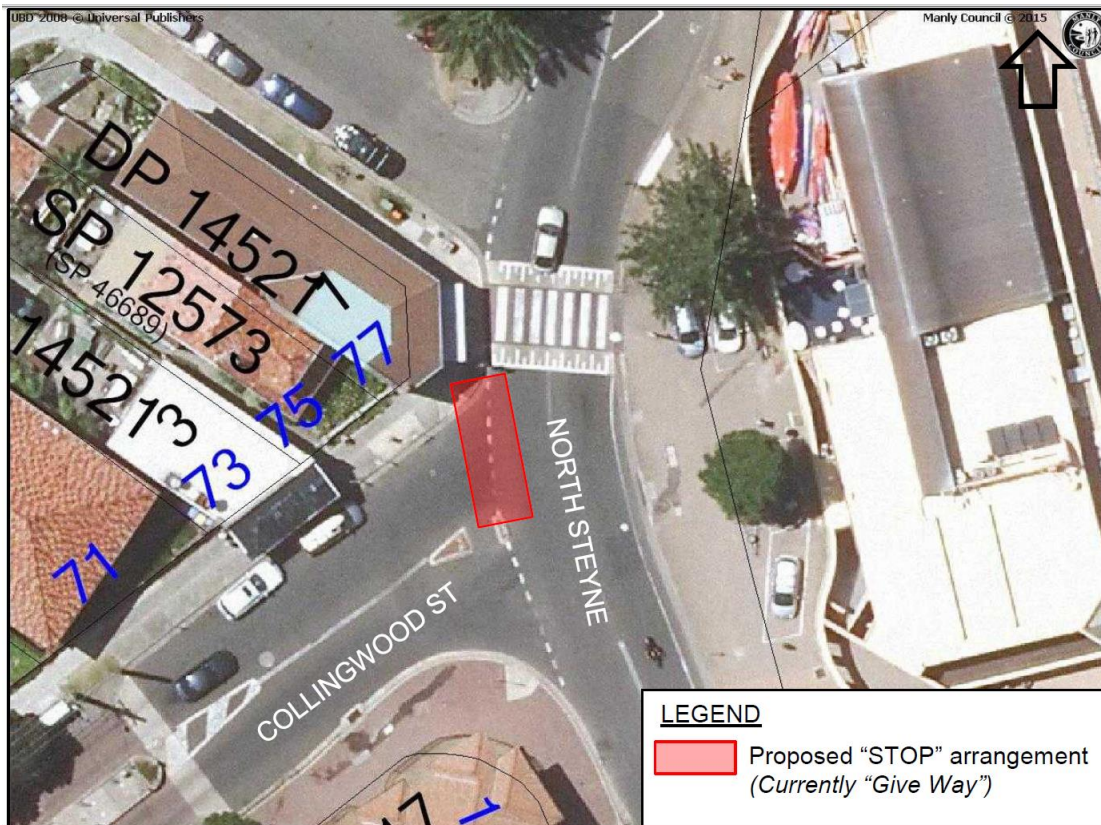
Collingwood Street / North Steyne intersection, Manly – Proposed changes to traffic arrangement
